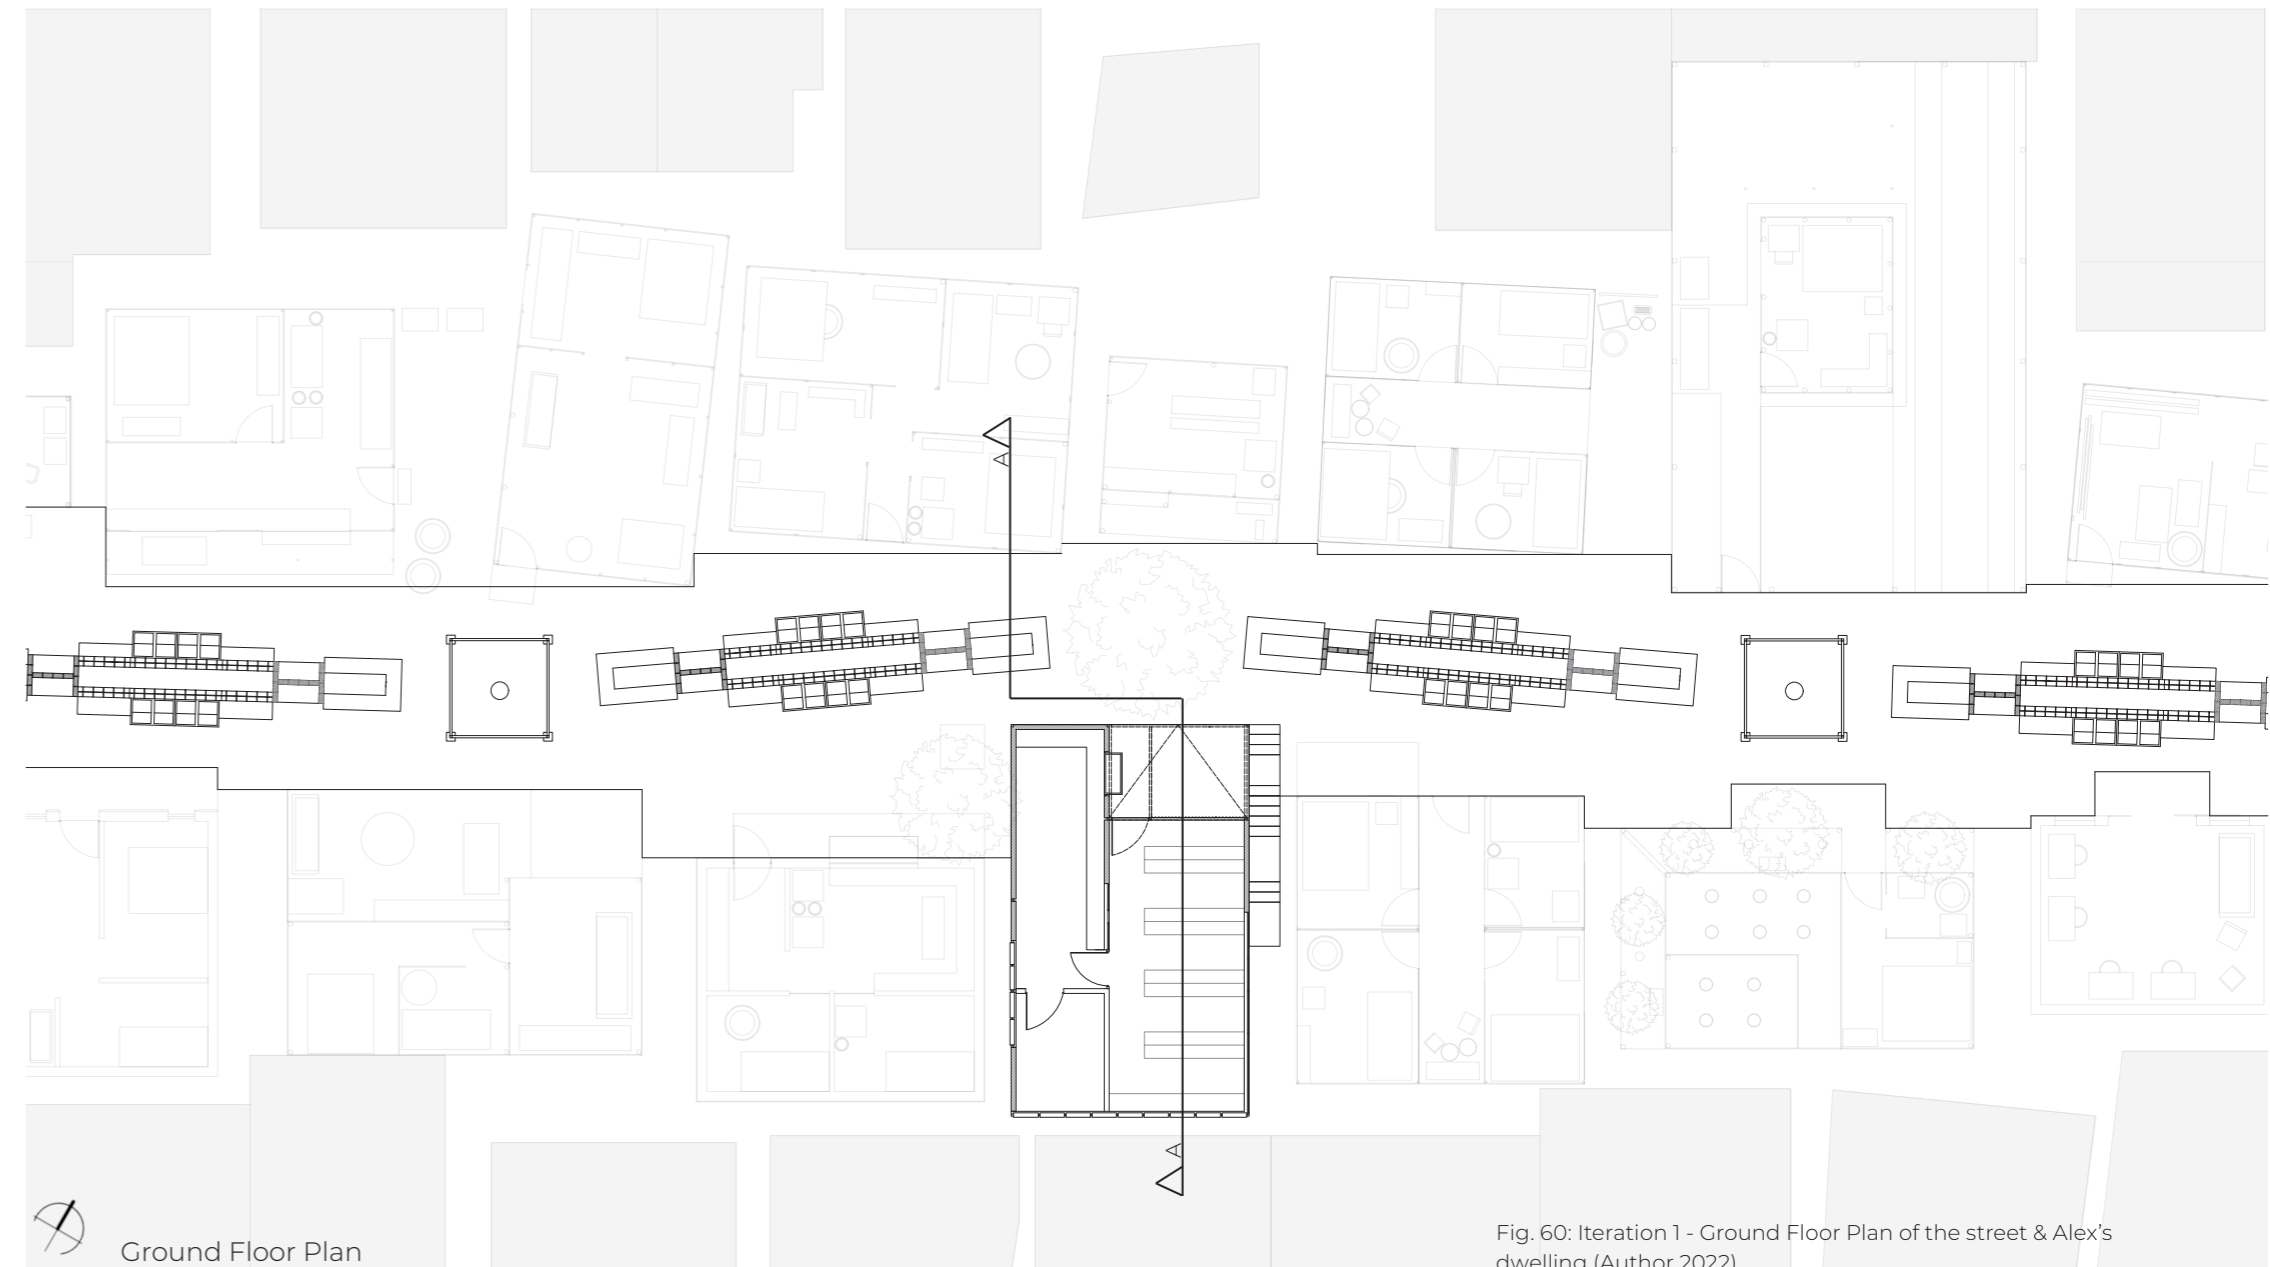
Iteration 1 - Ground Floor Plan of the street & Alex's dwelling (Author 2022)
